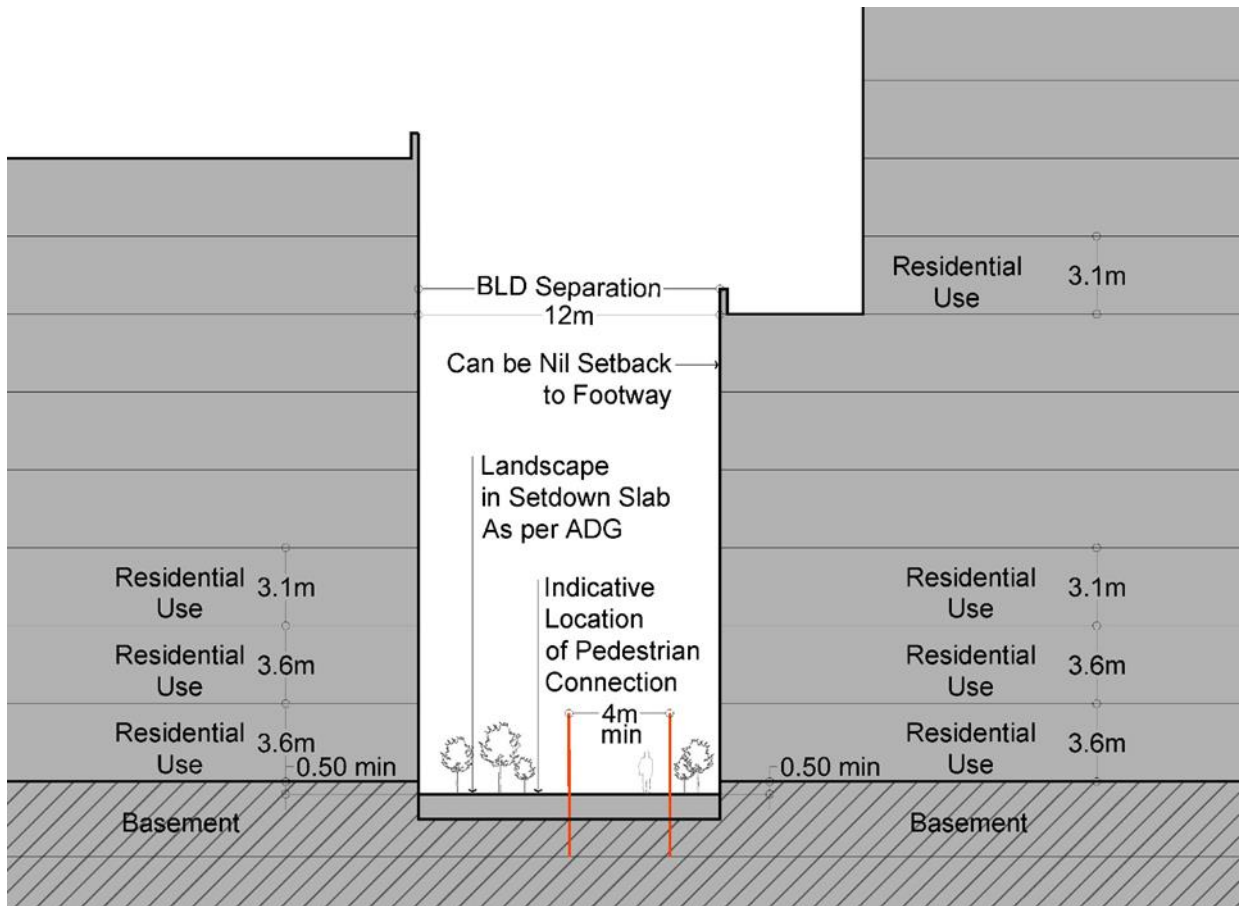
Street Wall Height at Pedestrian Connection, NTS
